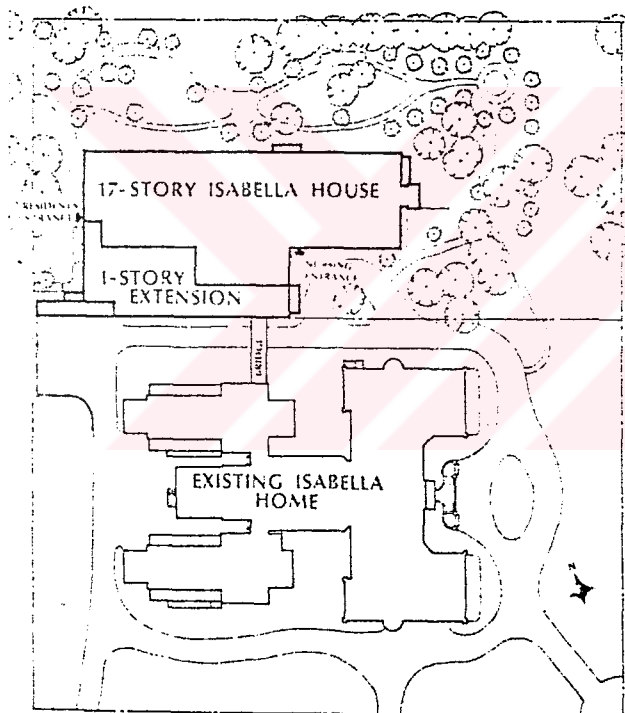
Multi Storey Building For Elderly Apartments. Isabella House, N.York, USA
